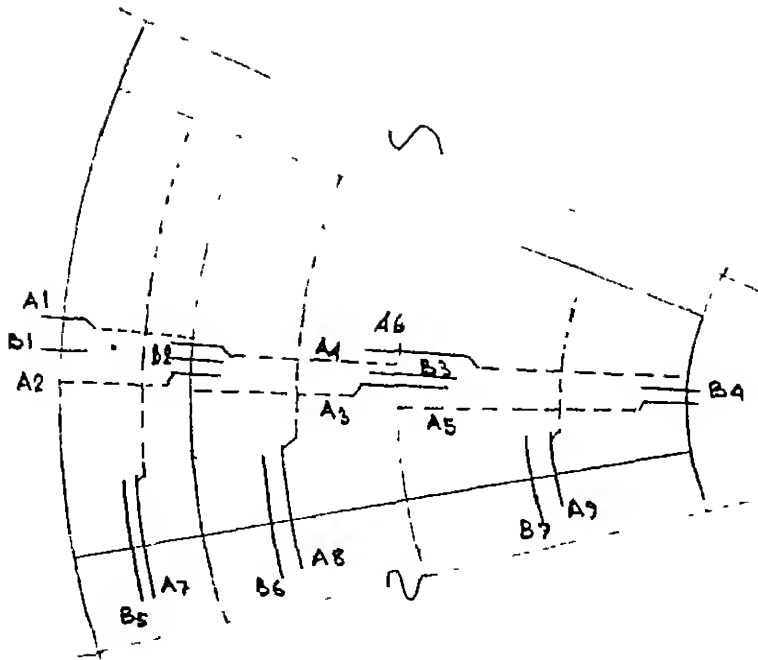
DIAGRAM FOR DETAILING OF REINFORCEMENT
